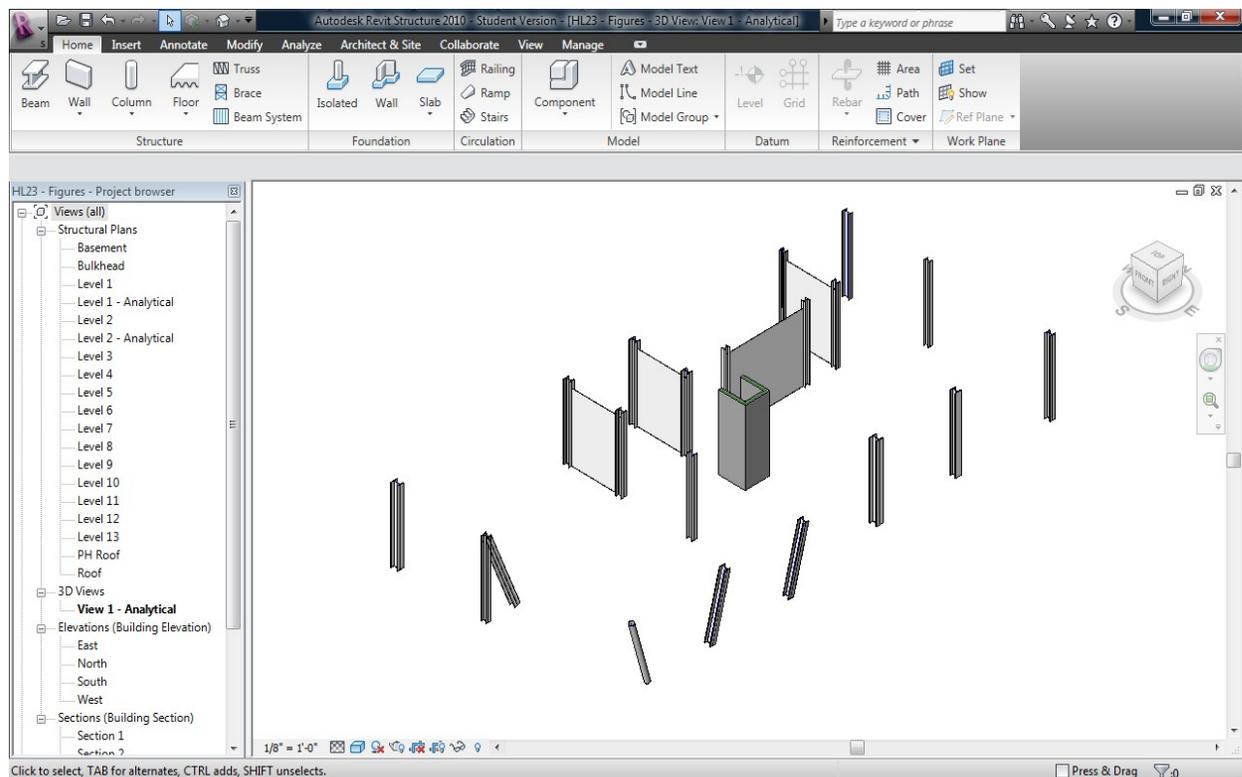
A 3D View of the Structural Wall Layout for One Level
